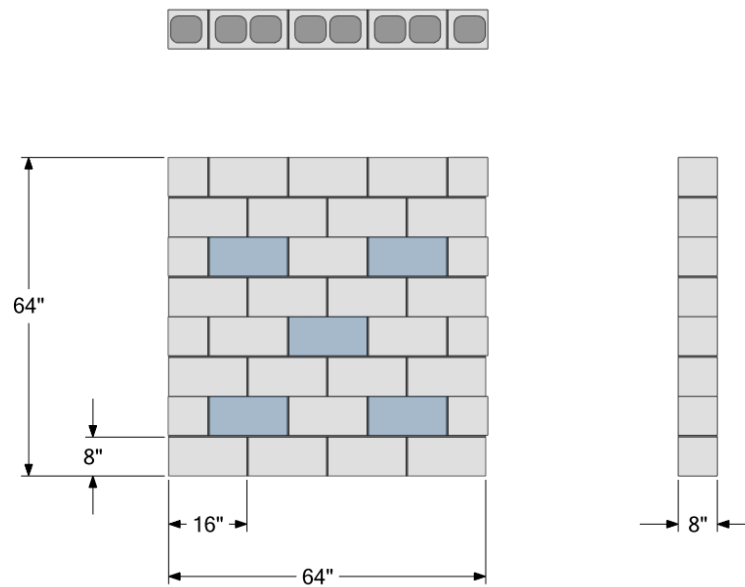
Masonry wall: Dimensions and blocks with surface and embedded thermocouples highlighted in blue.
